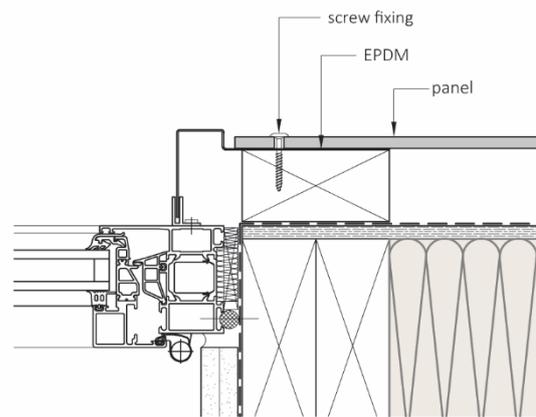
Typical installation details (continued) - screw fixing and timber subframe
